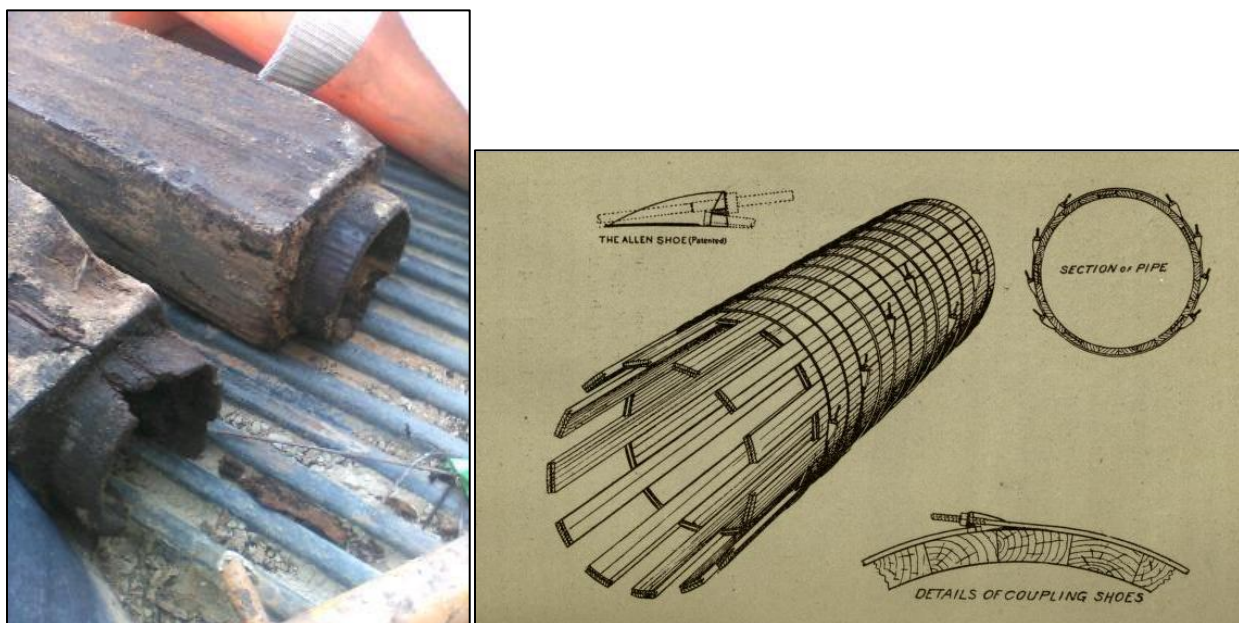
Milled wood pipe (left) used by the Fresno Water Works Company in 1876, and diagram of wood stave pipe (right).³⁷
